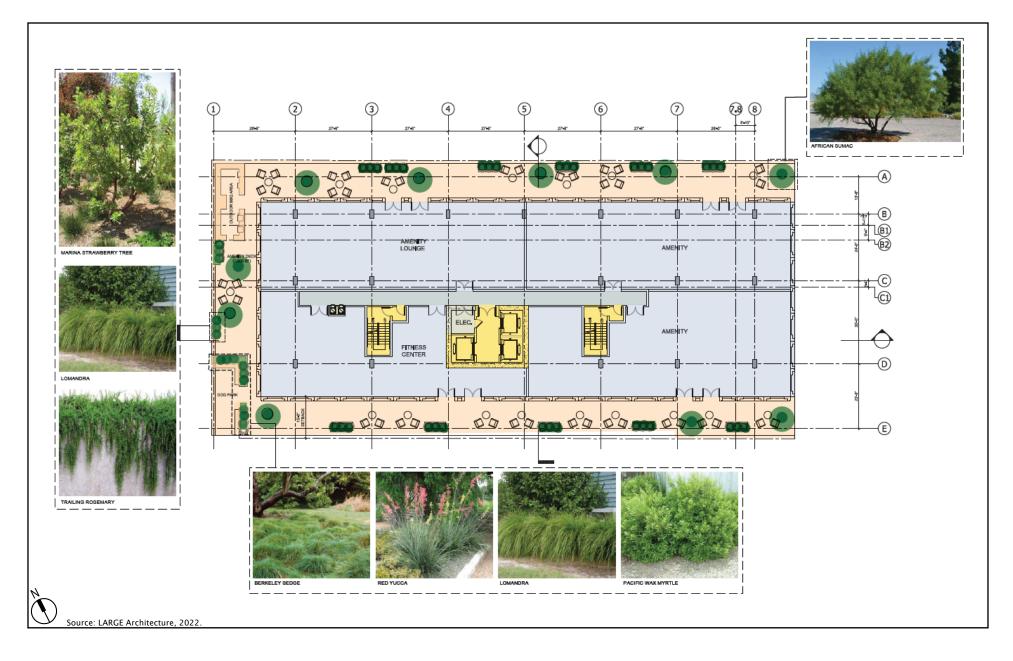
Landscape Plan - Amenity Level (Level 6) – 1431 Franklin Street Residential Project
